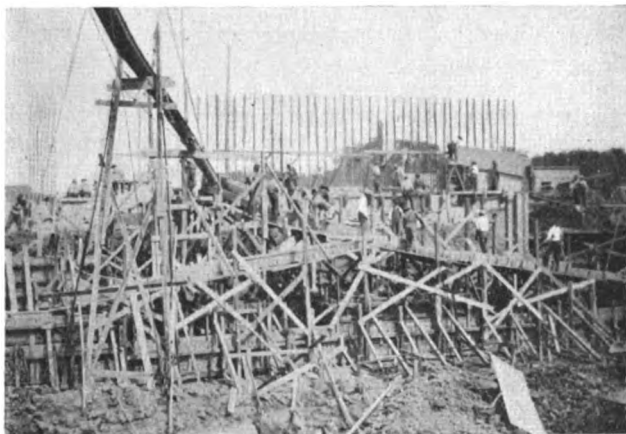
PLACING CONCRETE IN BASE OF BUILDING.
